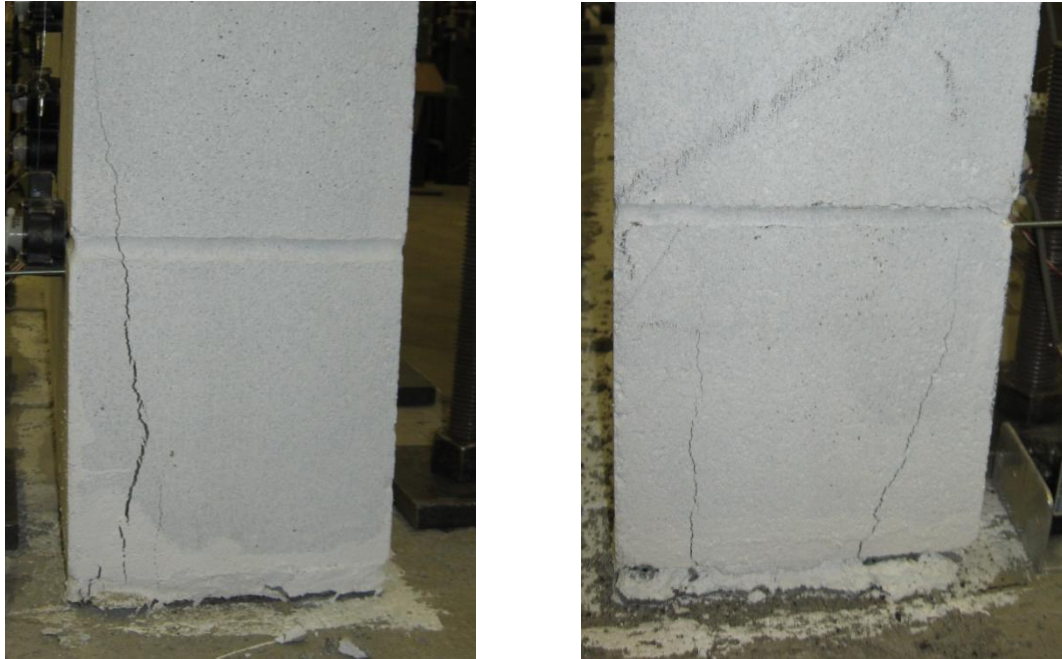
Wall C5: South Toe (Left) and North Toe (Right) at Onset of Toe Damage
